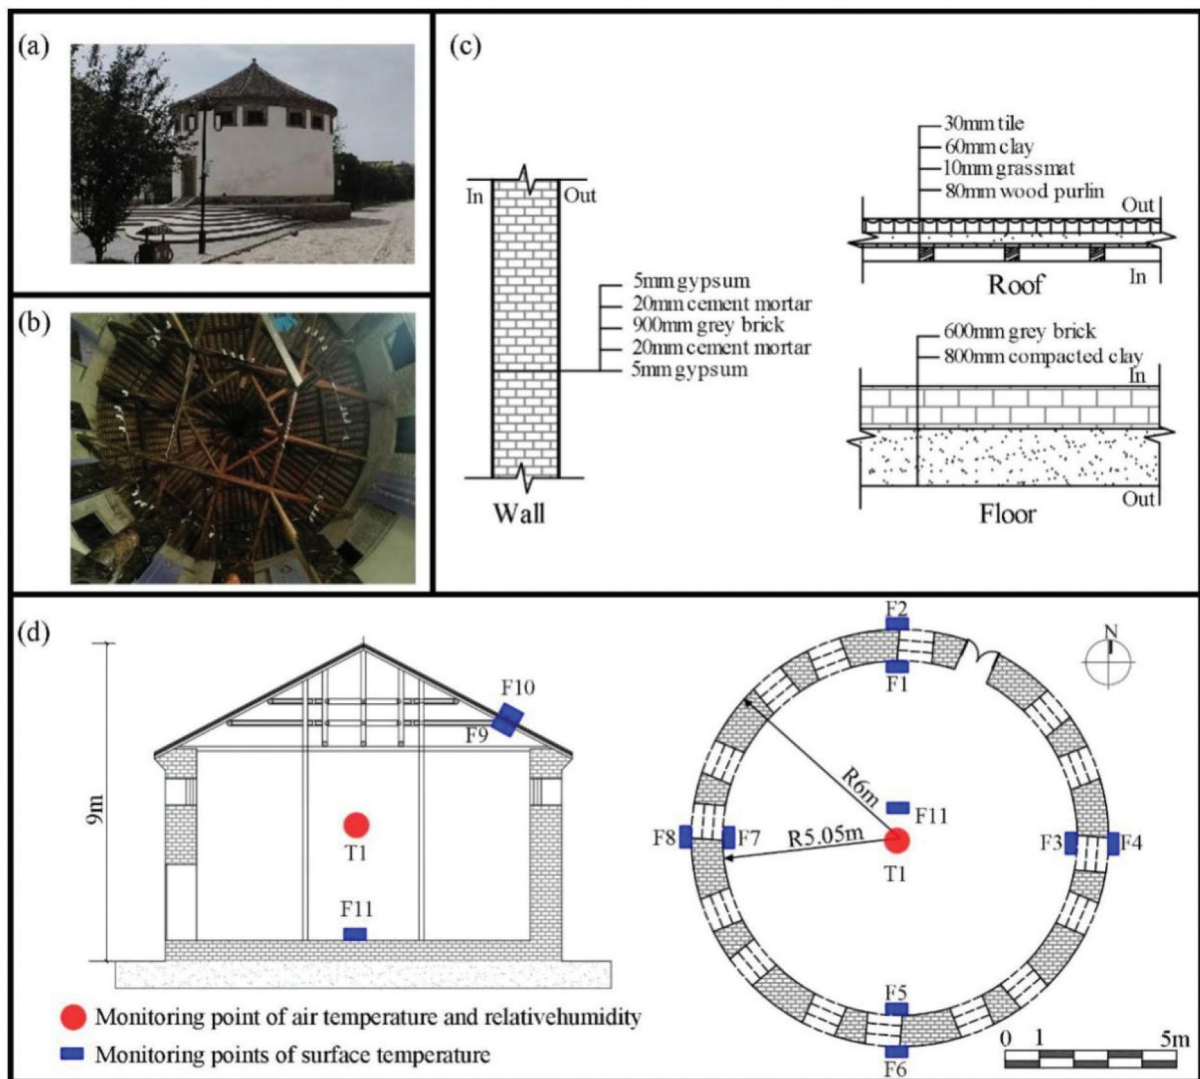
Architectural features of Tuyuan silo: (a) Picture of the silo; (b) Picture of the construction of inner roof; (c) Construction of envelope, and (d) Layout plan and section plan.
